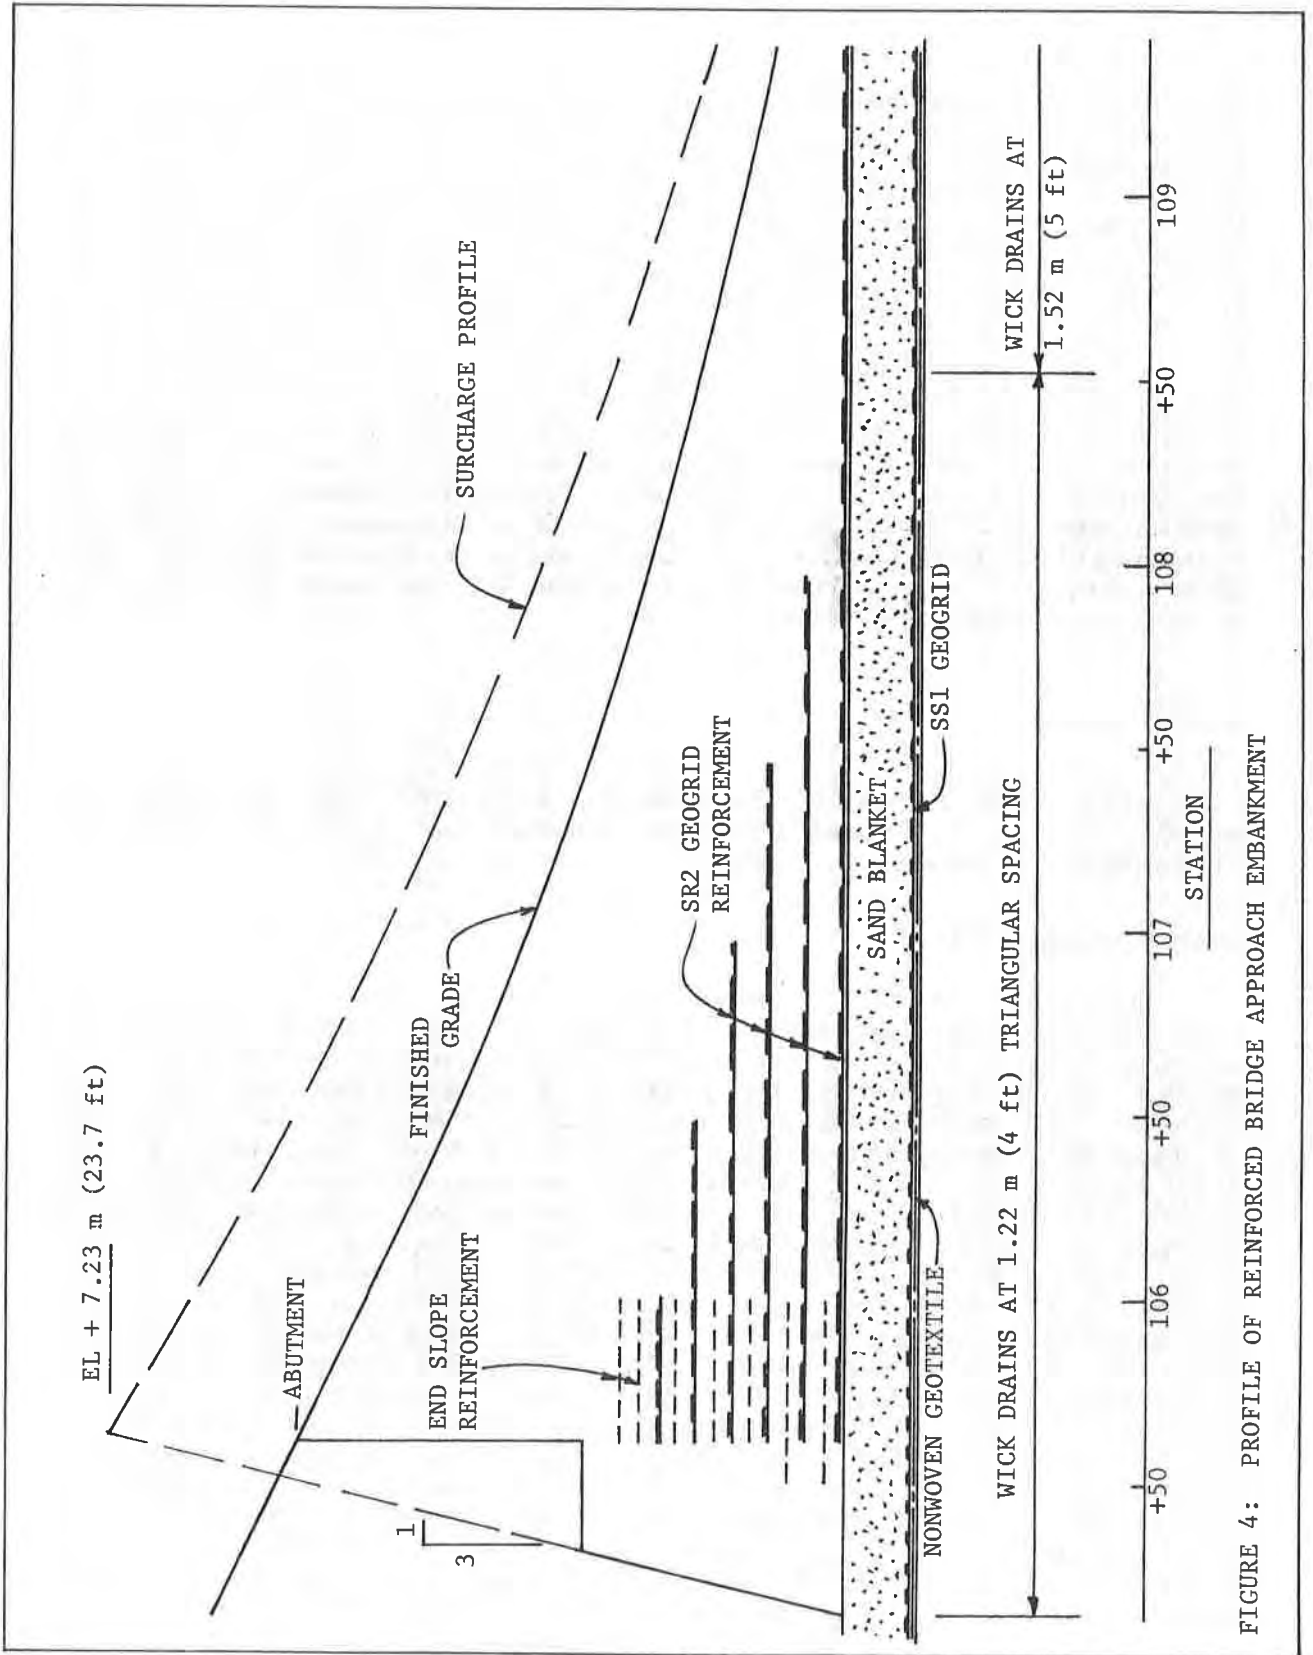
PROFILE OF REINFORCED BRIDGE APPROACH EMBANKMENT
